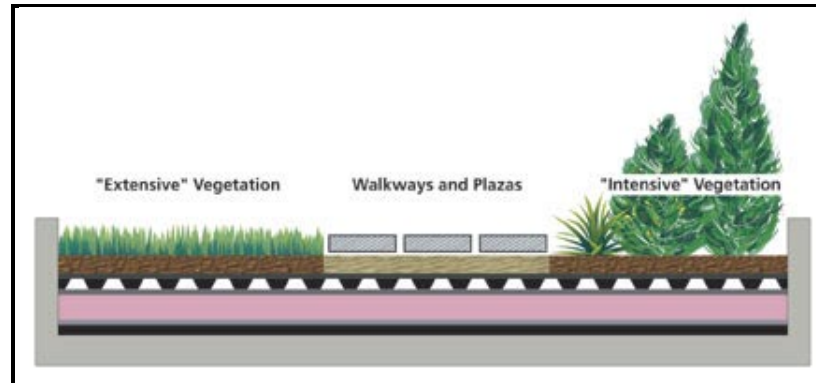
Extensive green roof system (left) and Intensive green roof (right) (Source: BAKOR).
